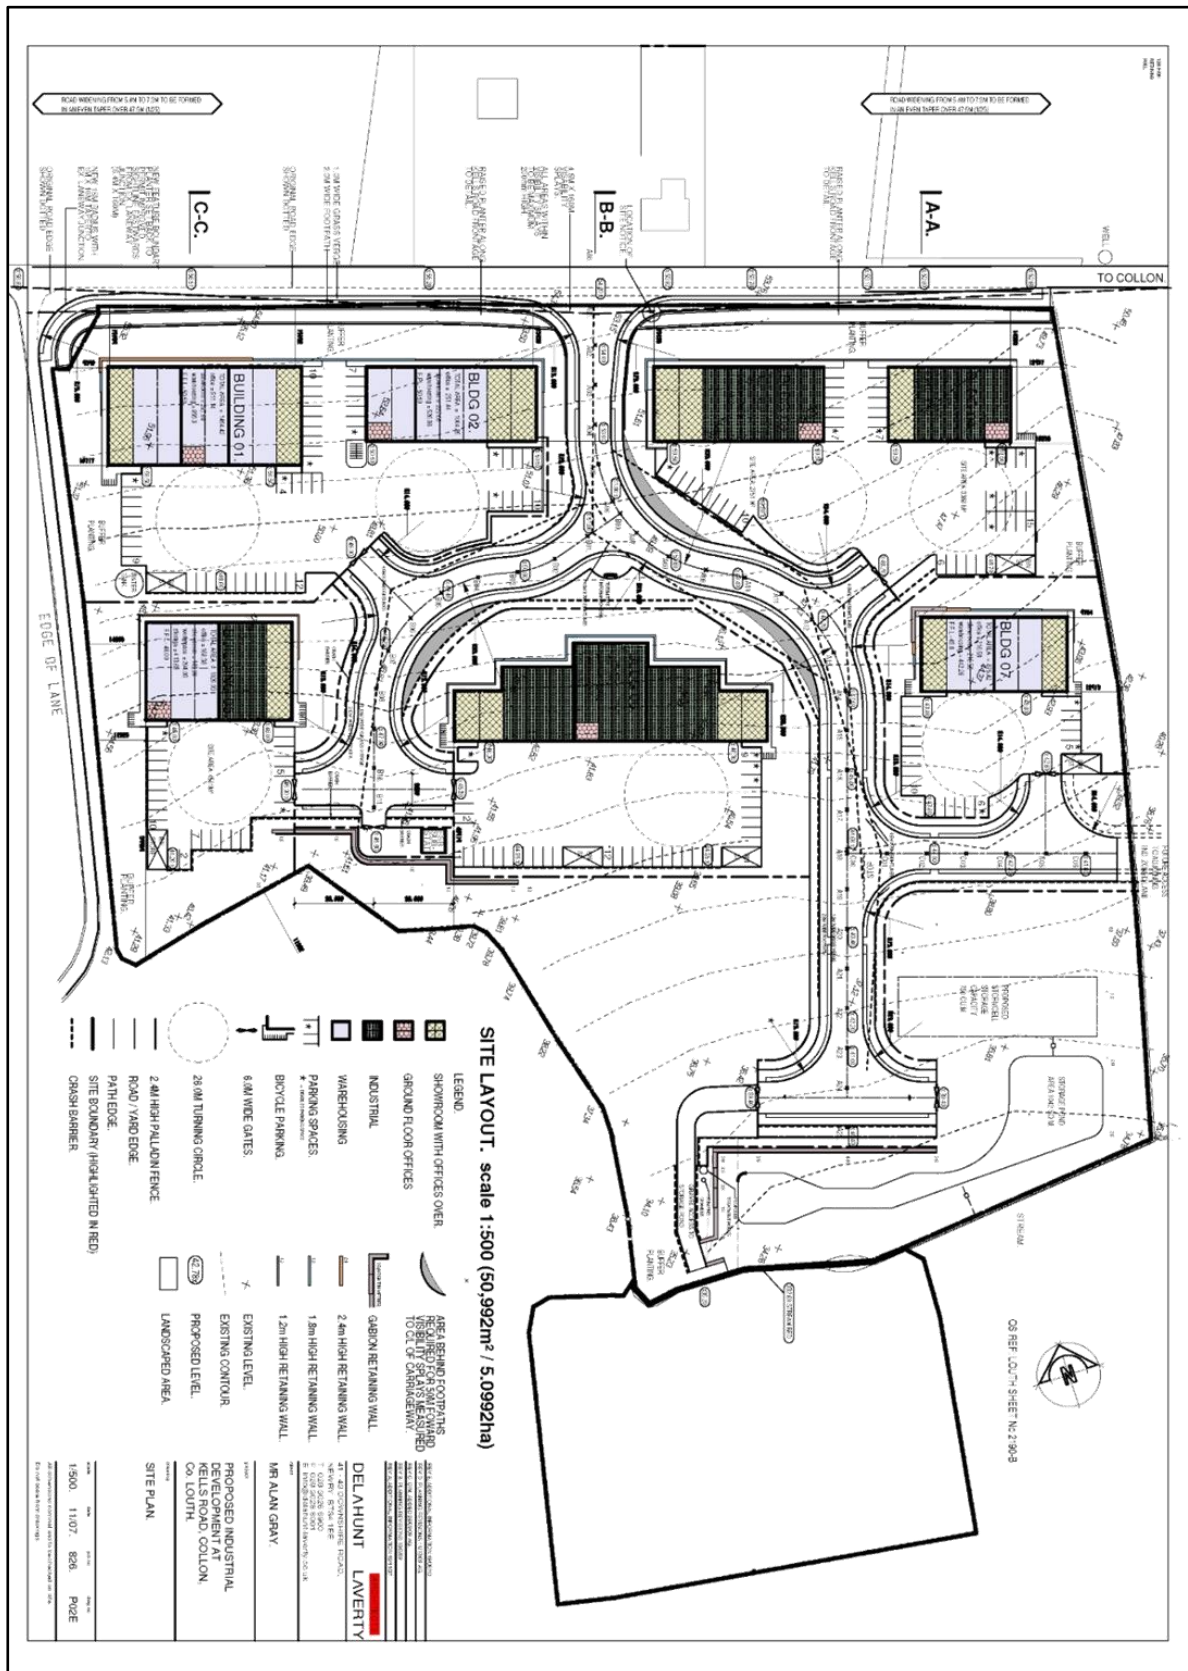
Site Layout of approved 2009 scheme (Ref: 09179 – 233788 ABP Reference).
